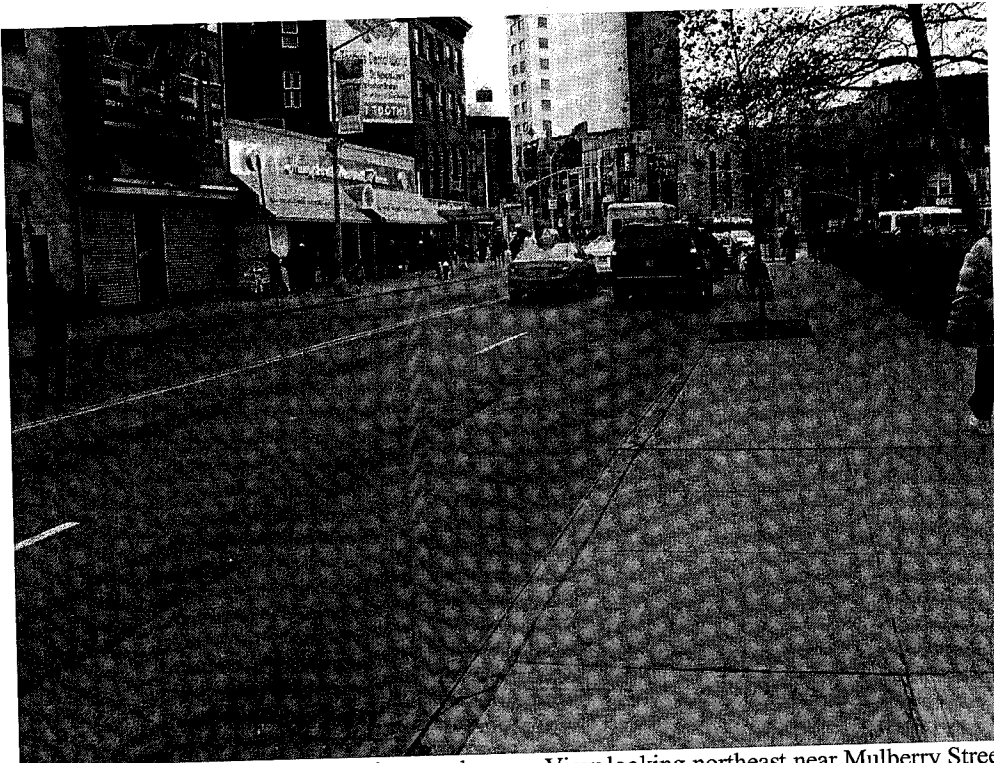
Example of embedded utility covers in pavement and patched asphalt. View looking northeast with Mulberry Street in background.
